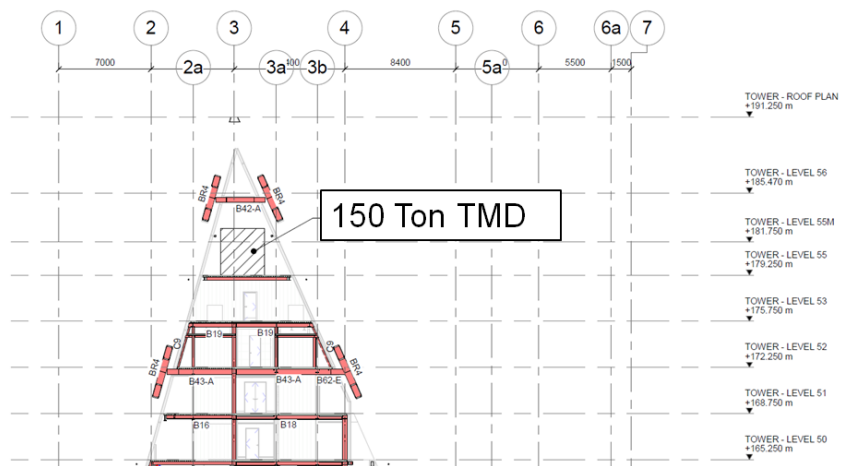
Upper floors elevation view for Arrangement VI – TMD location
